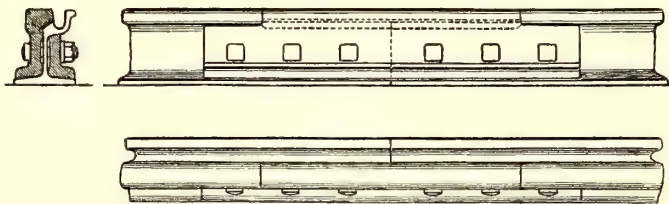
SHOWING LATER CONSTRUCTION OF RAIL-JOINT
